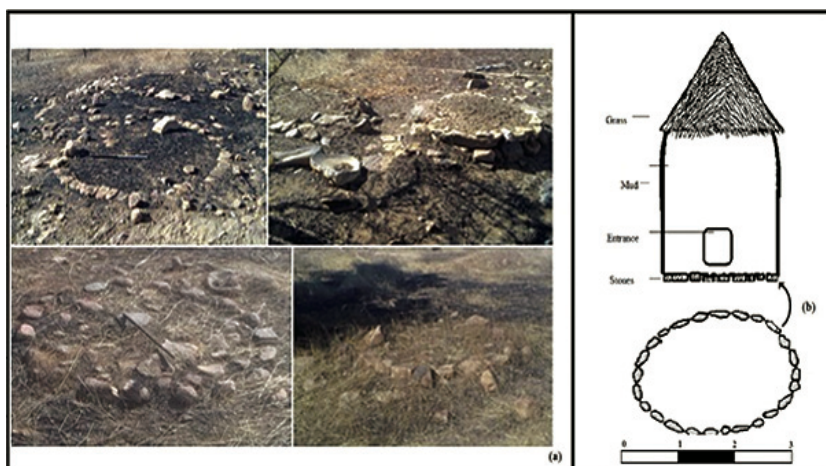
(a) Remains of el-Siwiba foundations, Damik site (photo by the author, 2019), (b) Reconstruction of el-Siwiba Building (drawing by the author, 2022).
